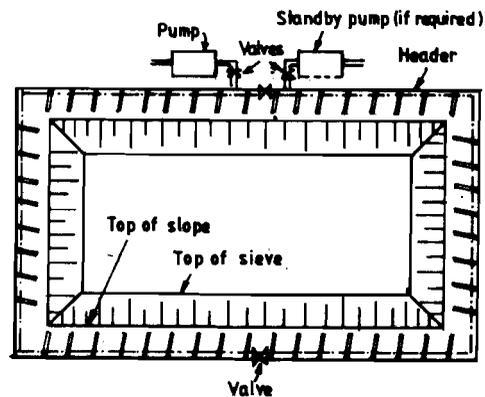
Single-stage Wellpoint Installation by the Ring System
